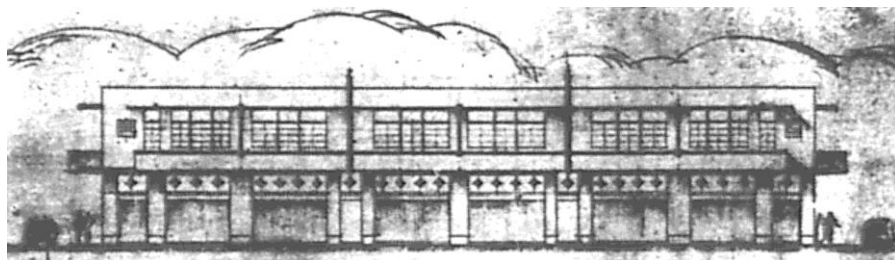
The plan of the two-storey buildings in Luen Wo Hui.<sup>103</sup>
